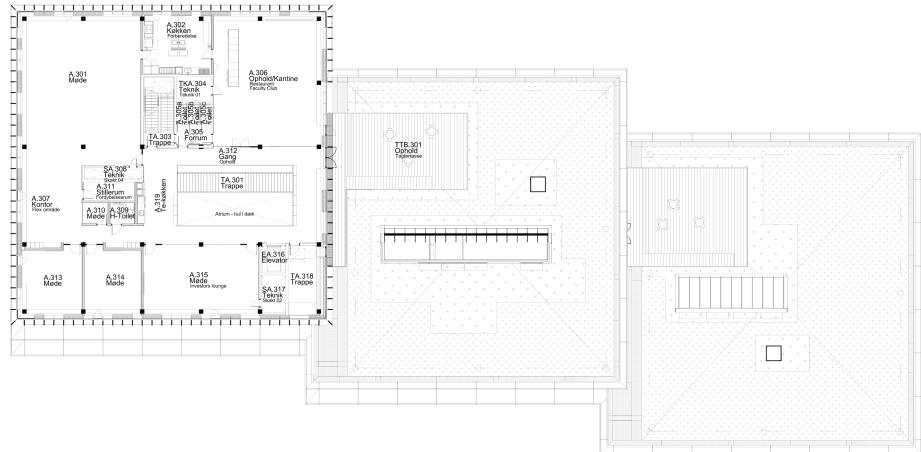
The floorplan of the second floor of the AAU Innovate building.
